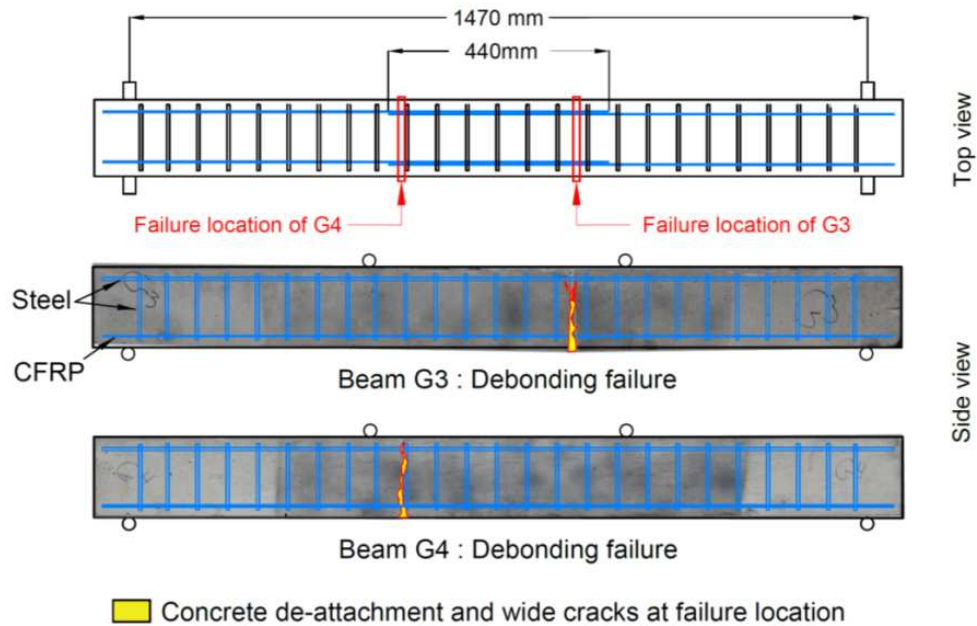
Failure zone and mechanism for beam specimens with CFRP spliced bars at elevated temperatures.
